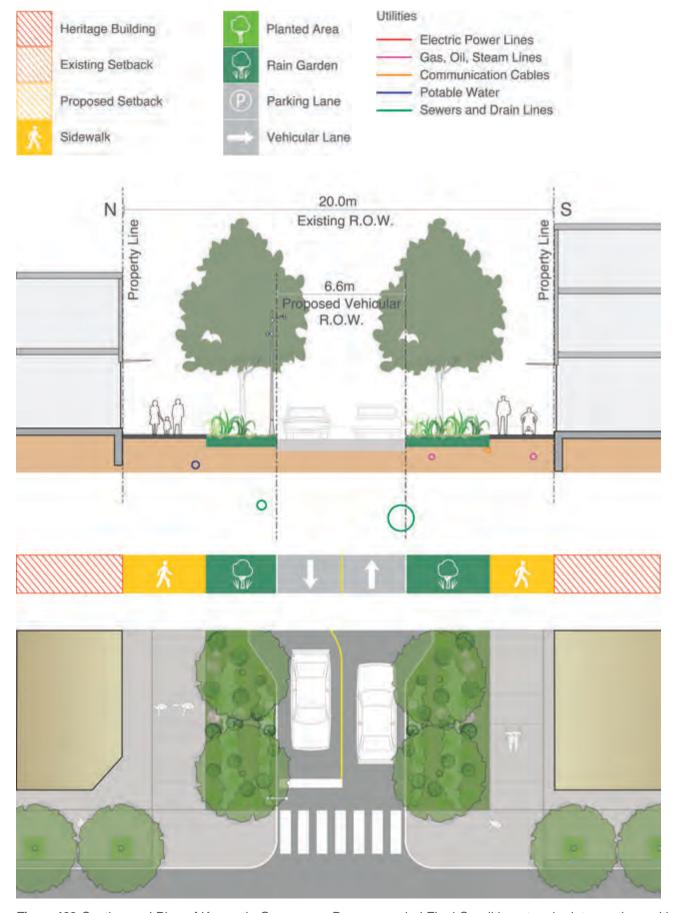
Section and Plan of Keewatin Greenway - Recommended Final Condition at major intersections with constrained sites
